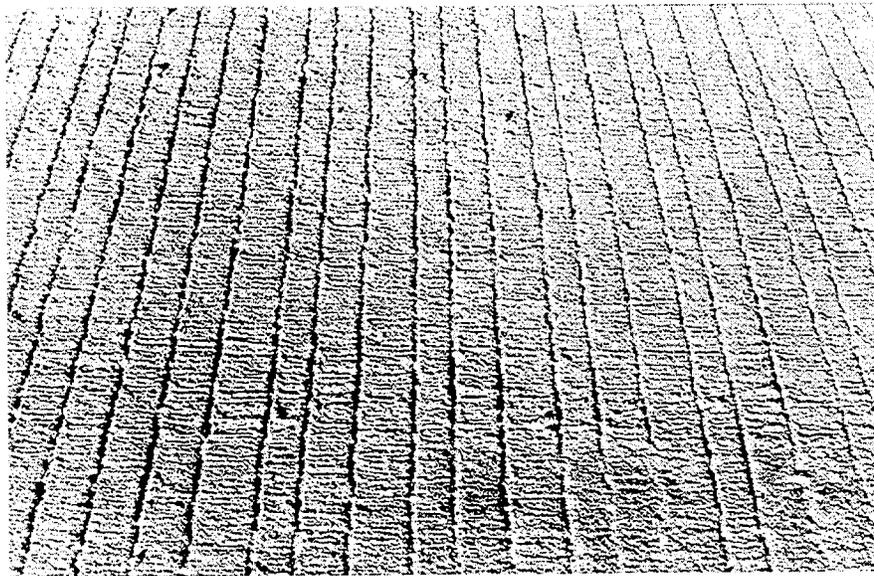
Random transverse tining with 5/8", 7/8", and 3/4" spacing
